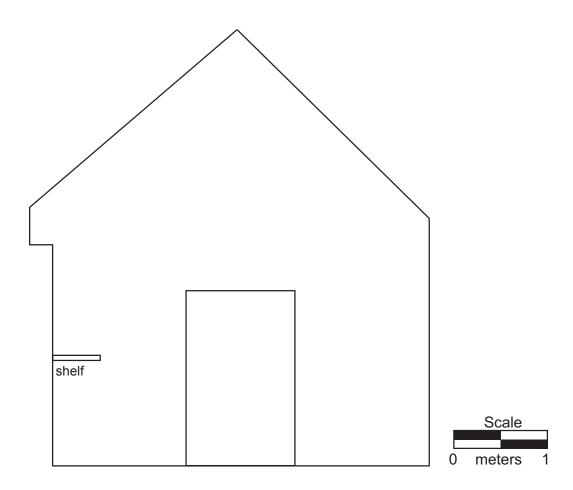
Elevation of southeast interior side of stone structure at Rancho El Saladito.
